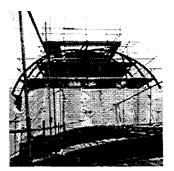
Welding wrought iron. Corroded parts of the upper and lower edges of a profile are ground off and new material is welded on, Palm House, Kew.
